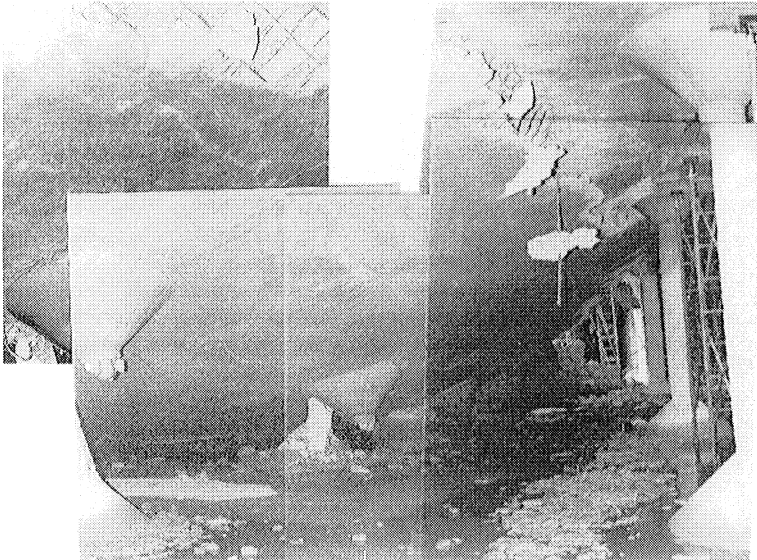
Hinge formed at south edge of collapsed roof section at column line 6f
